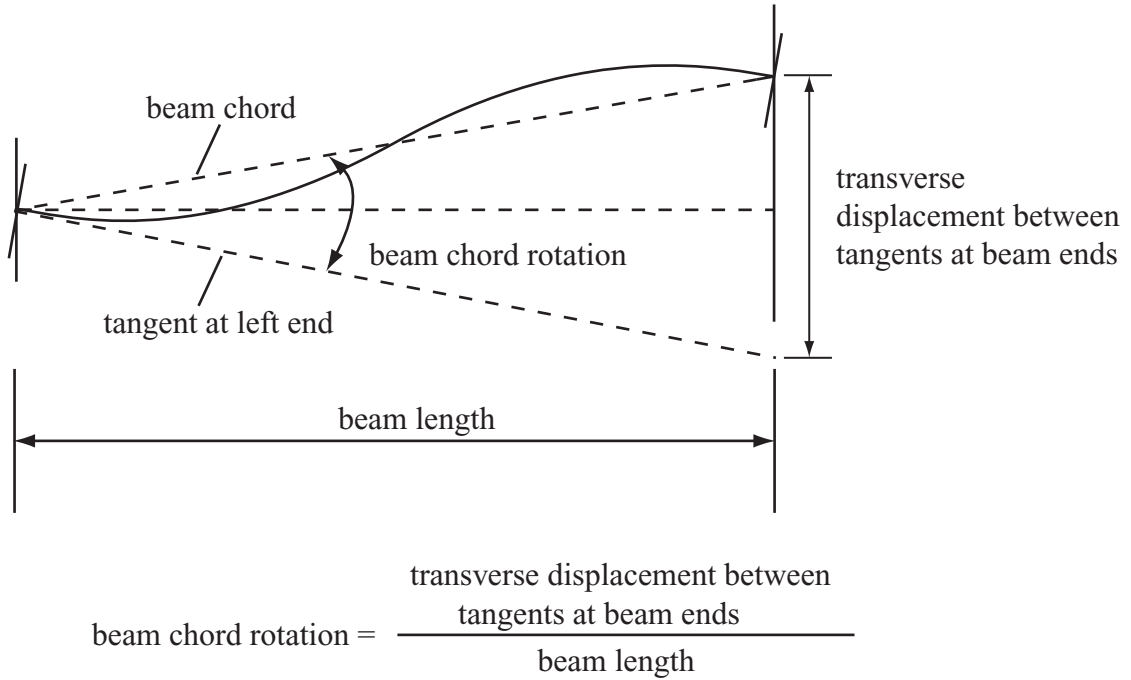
Calculation of coupling beam chord rotation, θ_b in multi-story coupled wall
